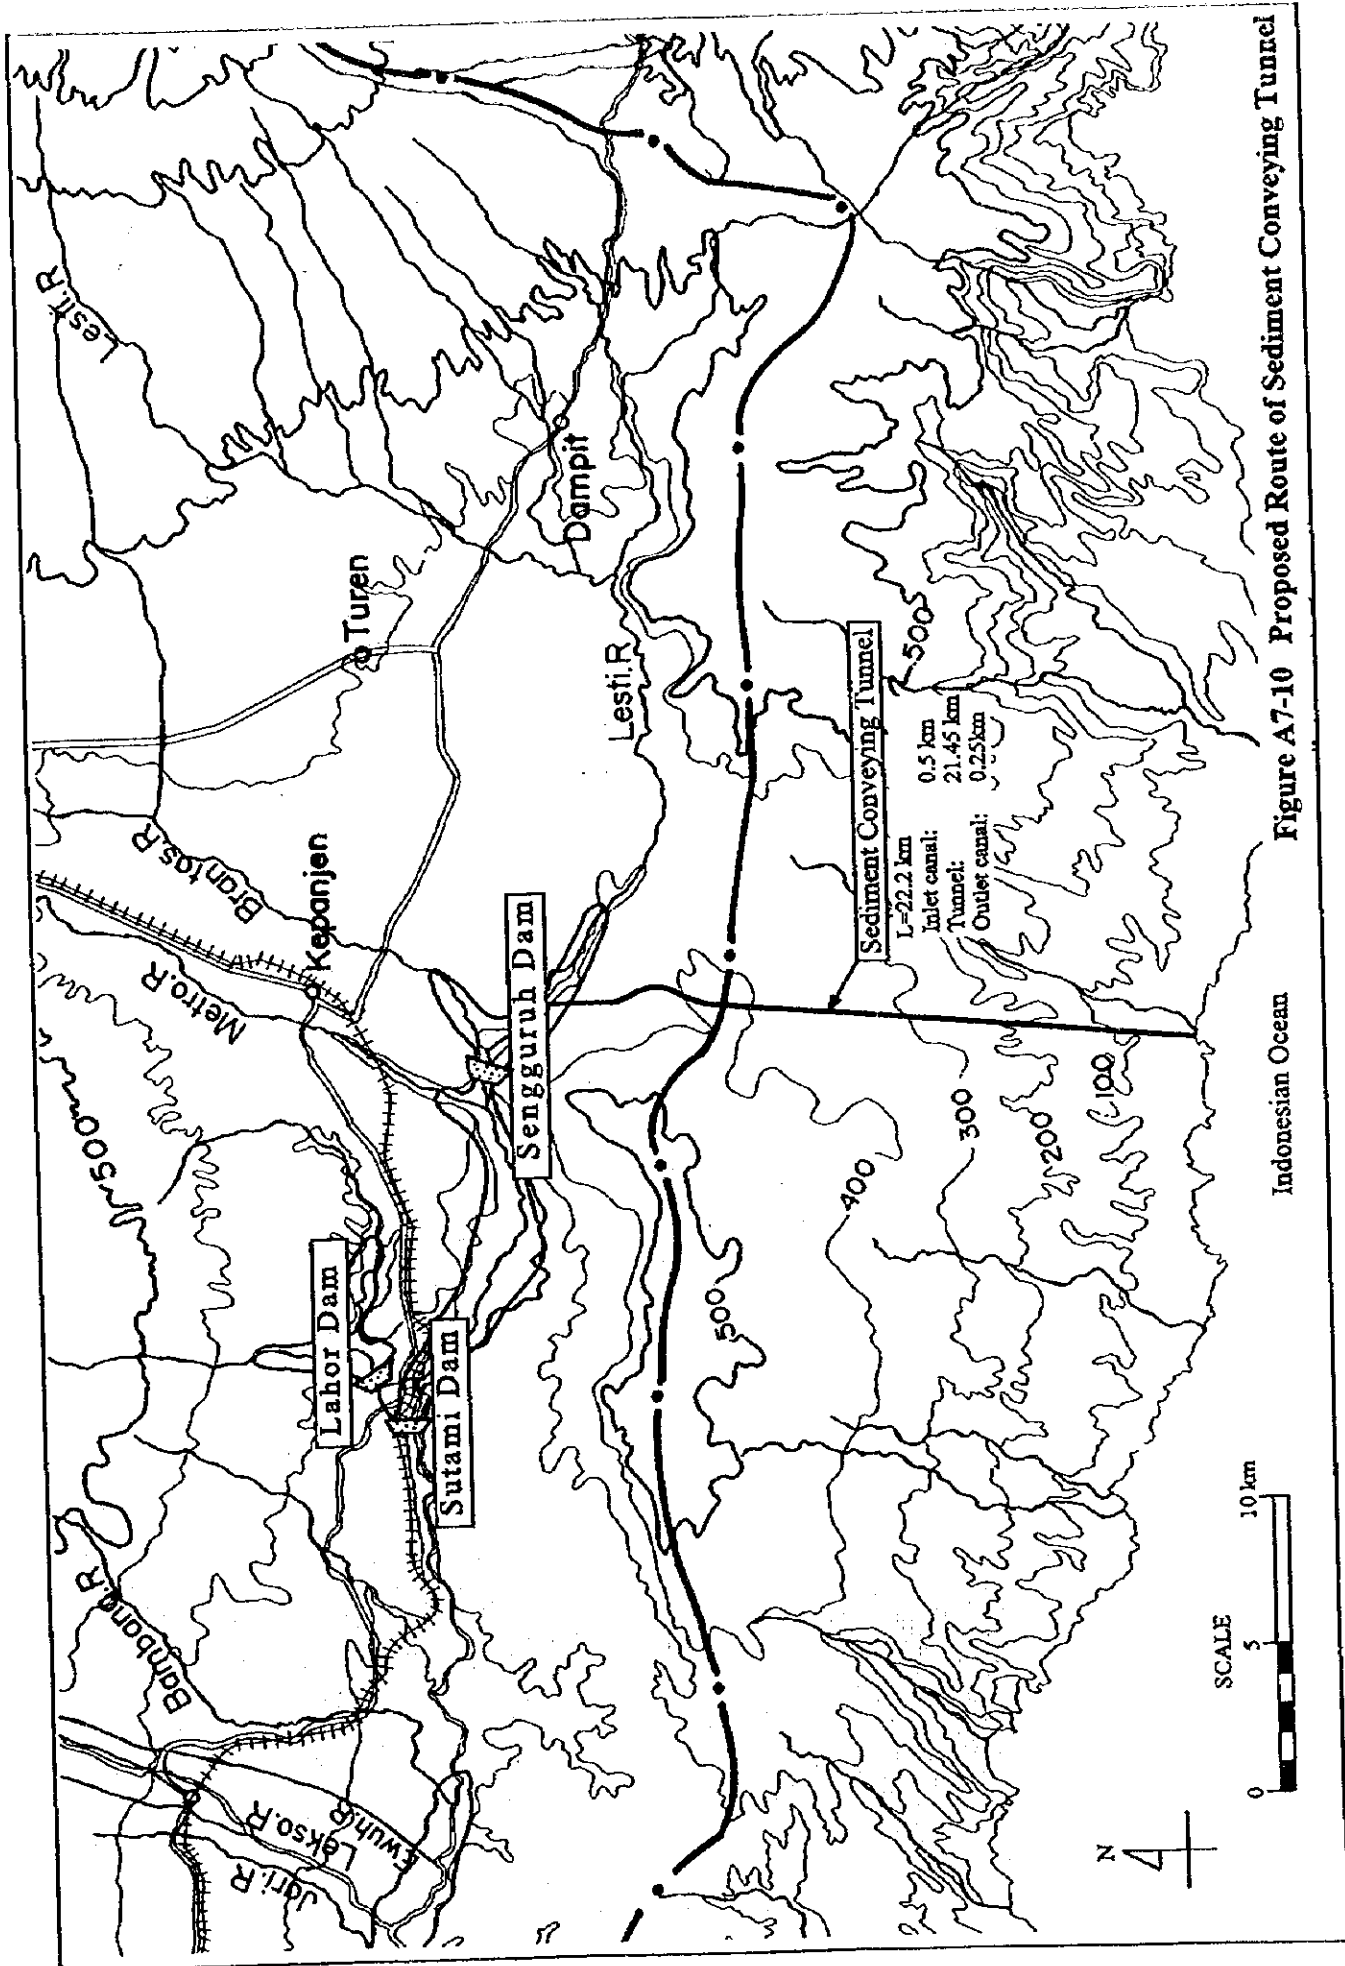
Proposed Route of Sediment Conveying Tunnel
